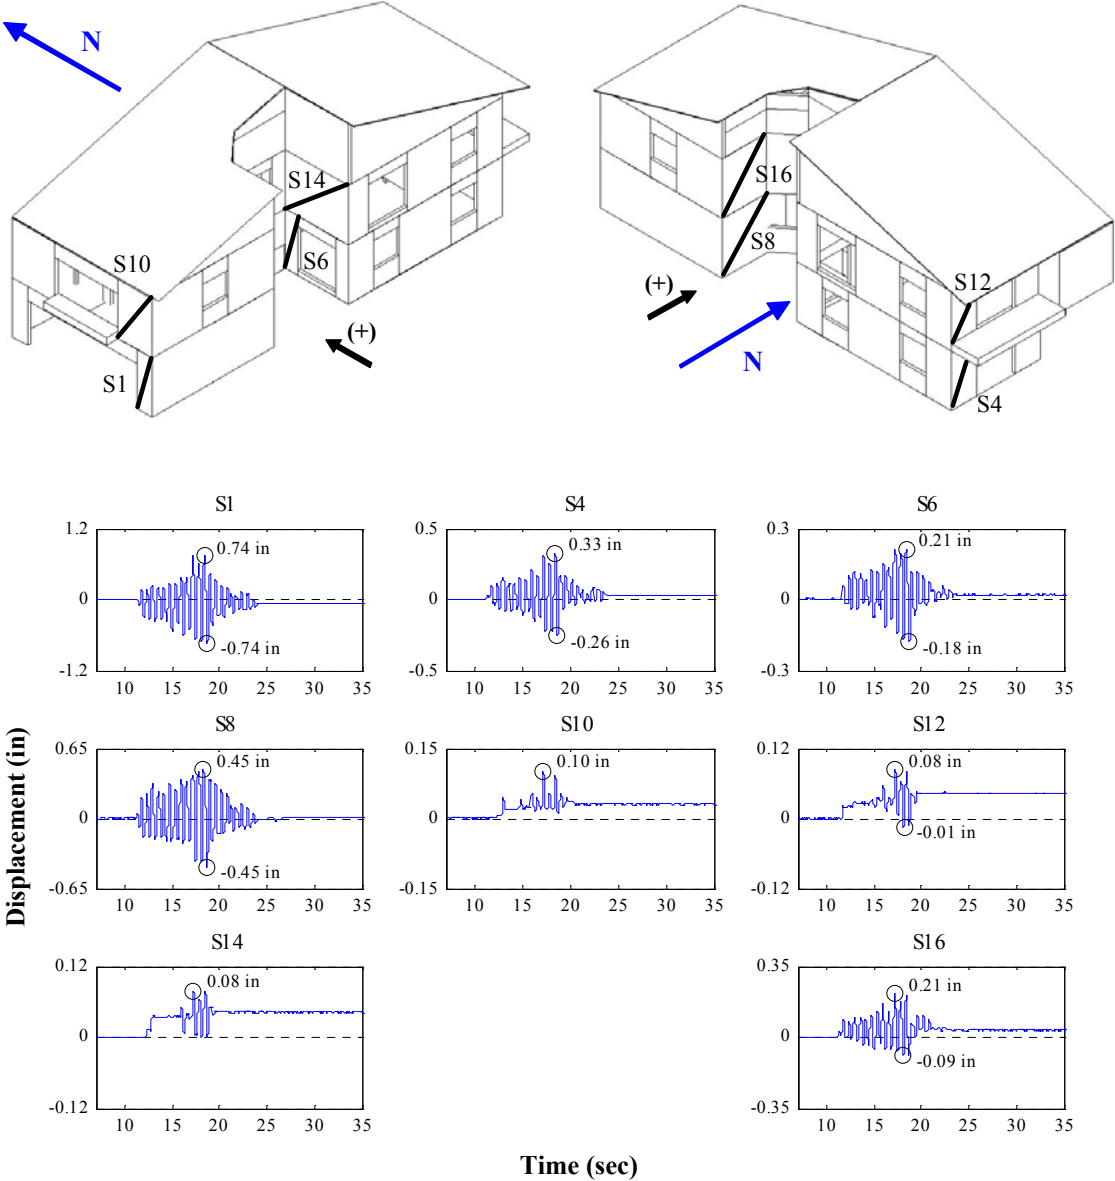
Wall deformations of north-south external walls for Test NWP4S04
